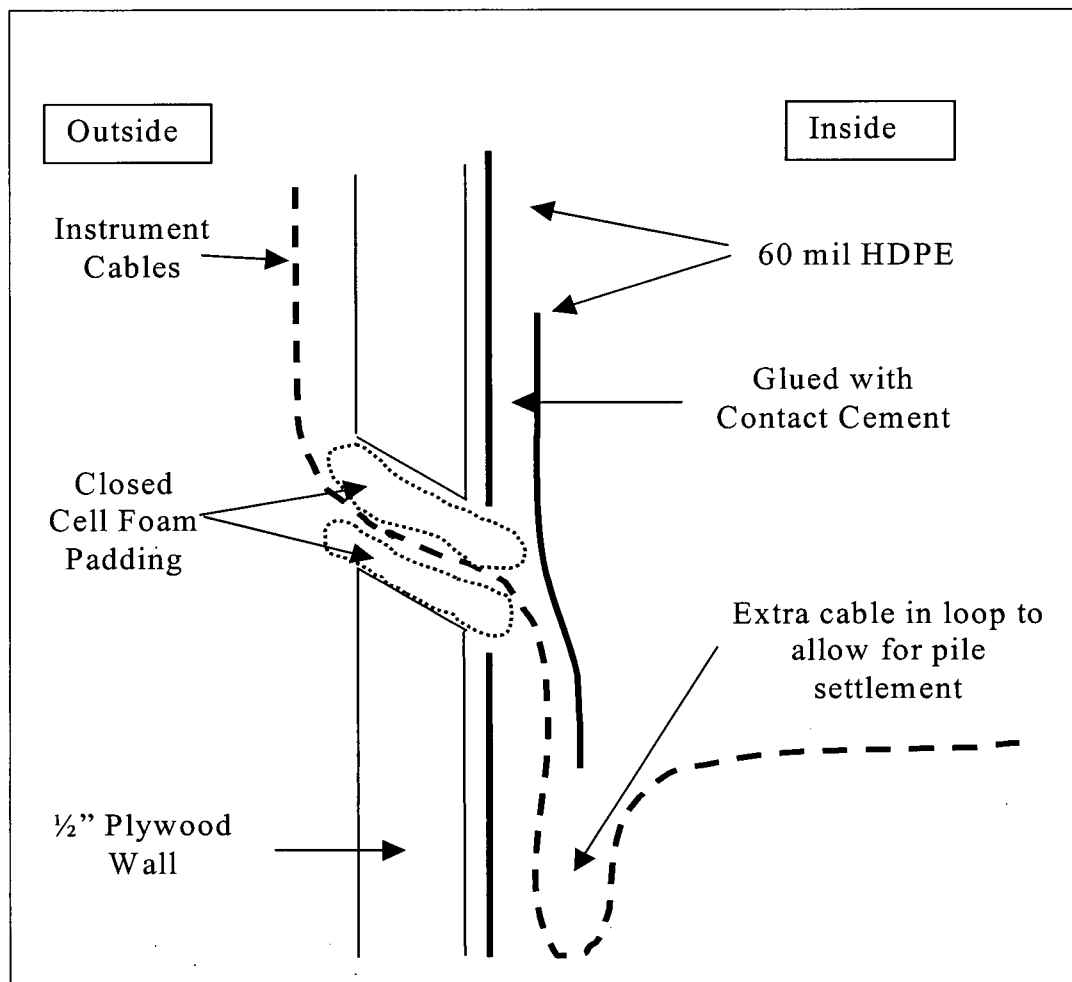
Detail Cross Section of Instrument Cable Passing through HDPE Wall
